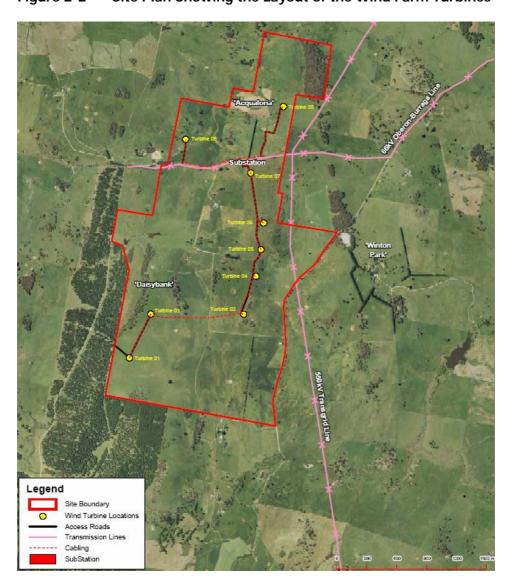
Site Plan Showing the Layout of the Wind Farm Turbines
